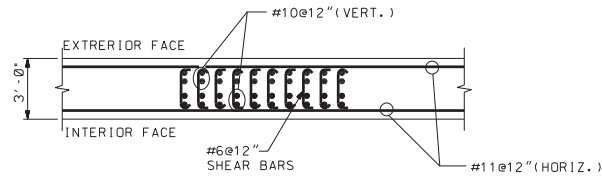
A-43 Reinforcement Arrangement of the AB MCR Wall (Section 1)
